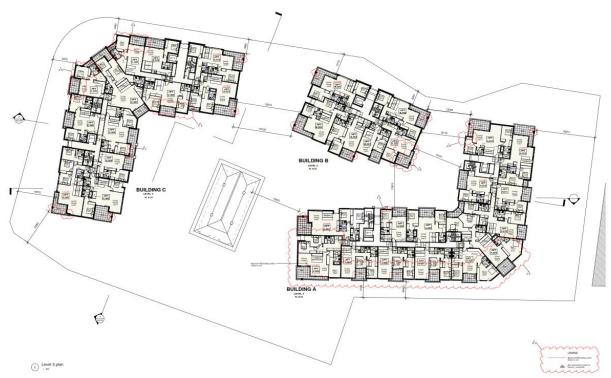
Pacific Lodge & Level 3 Floor Plan (Dwg No. A 2.05)
